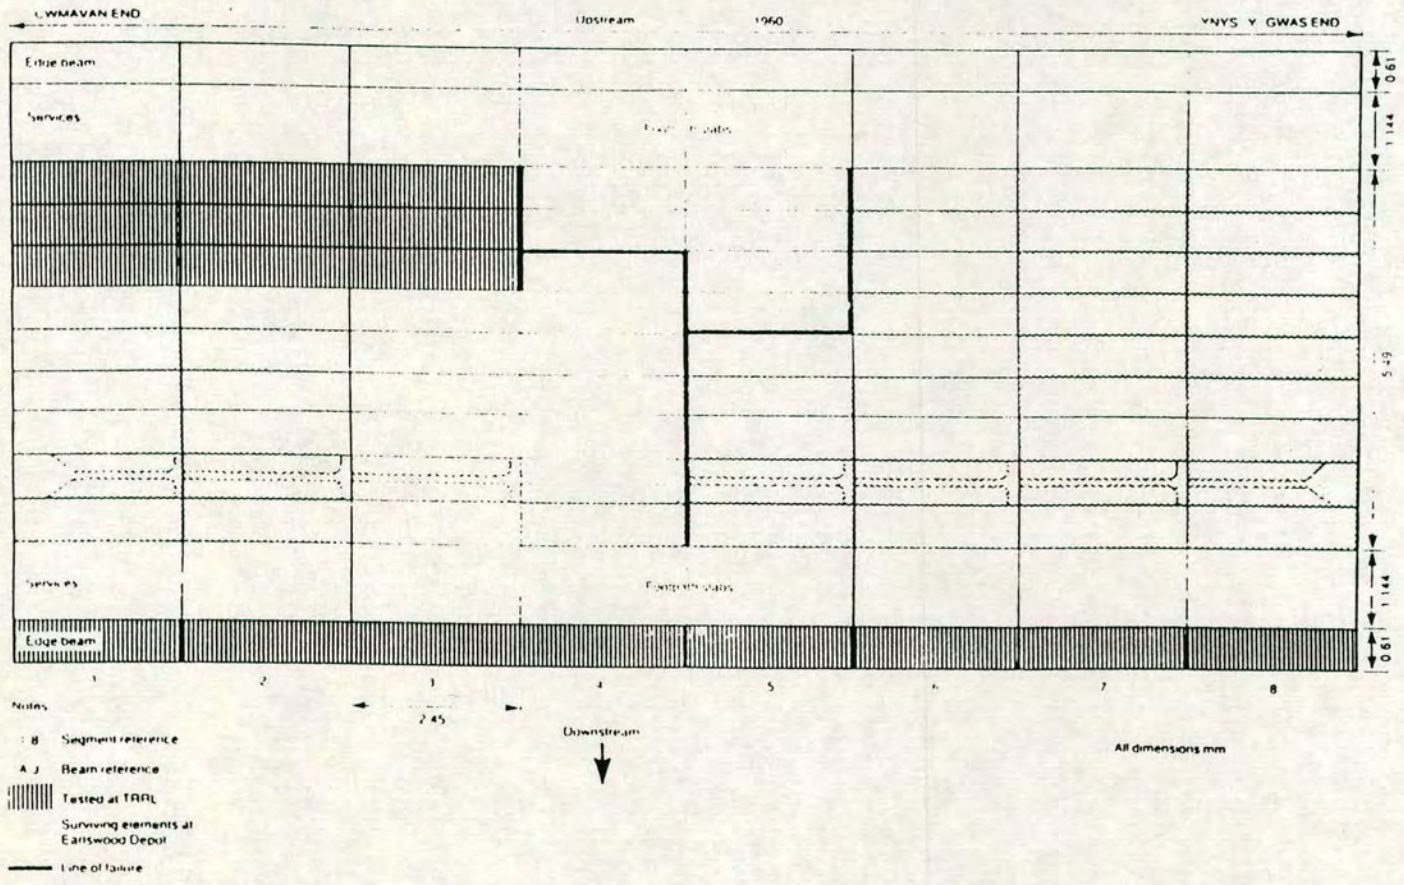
Deck Layout of Ynys-y-Gwas bridge showing the line of failure
